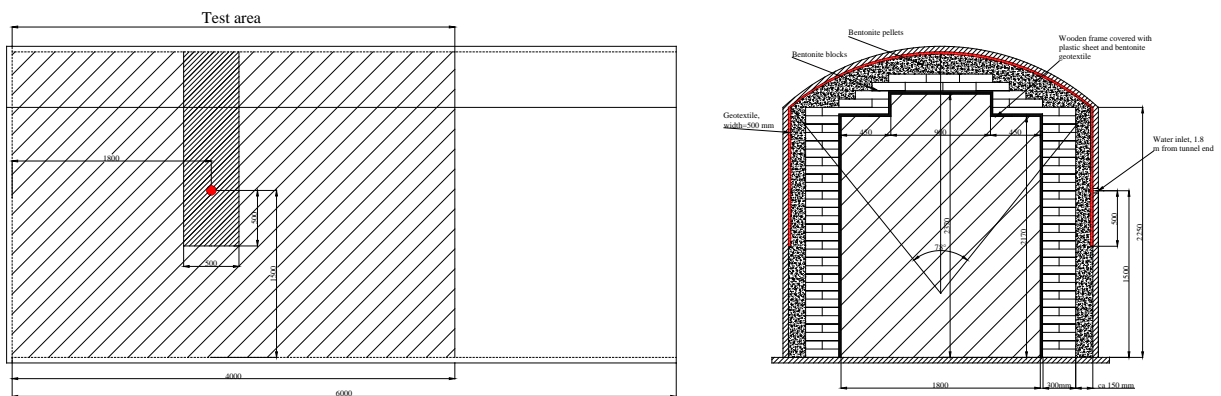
Schematic of the 1/2-scale steel test tunnel.[2]
